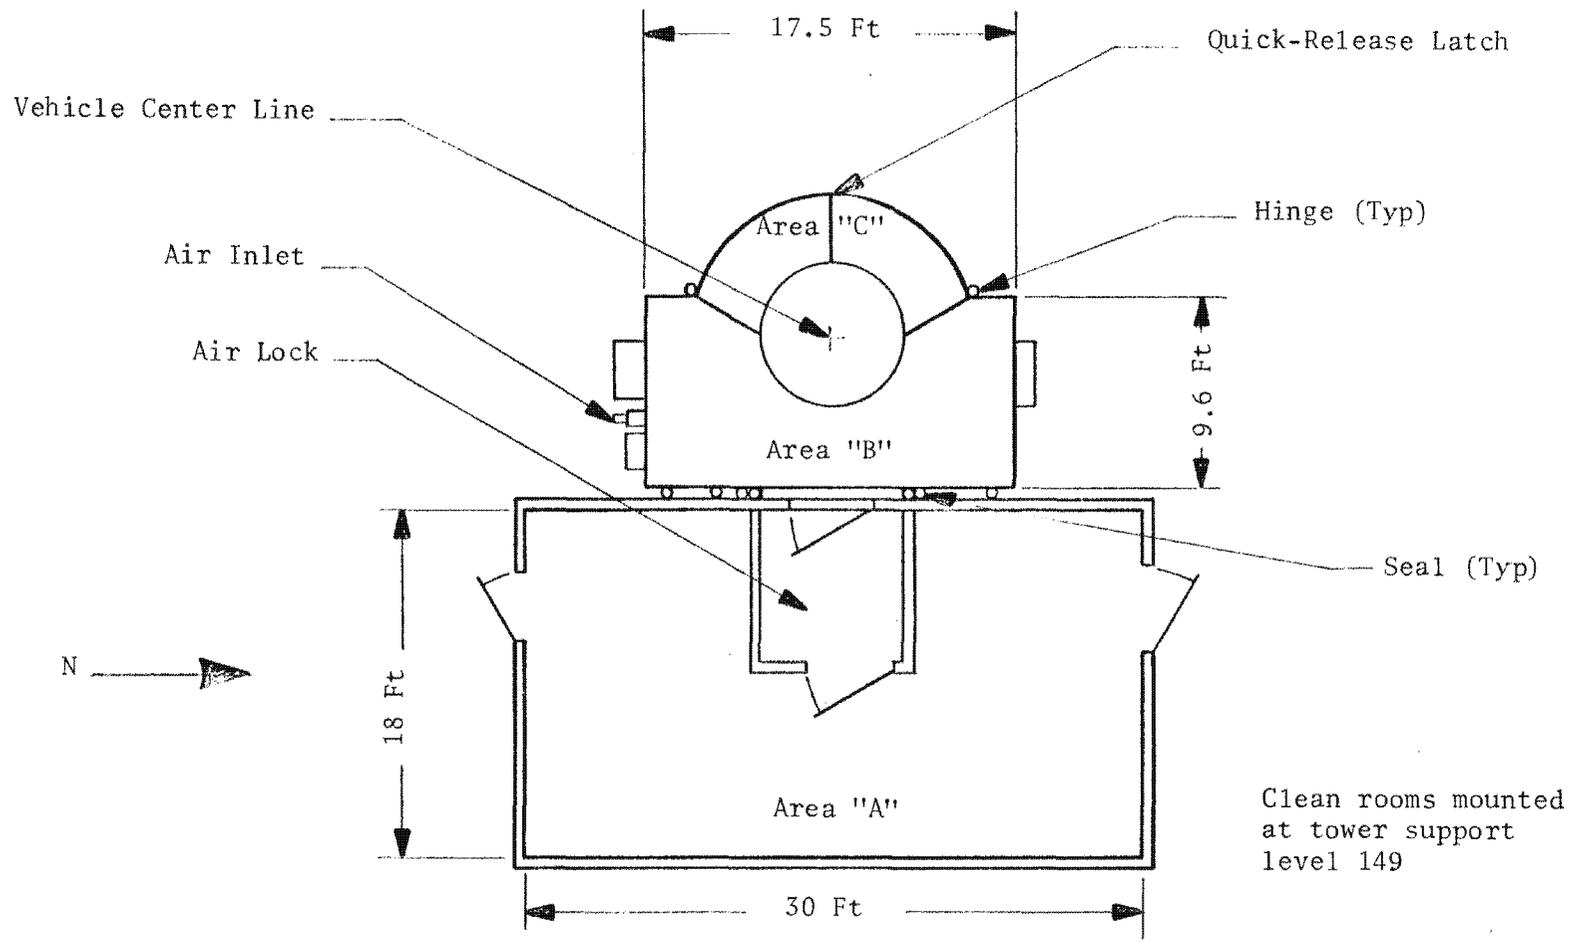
Floor Plan, Gantry Clean Rooms
